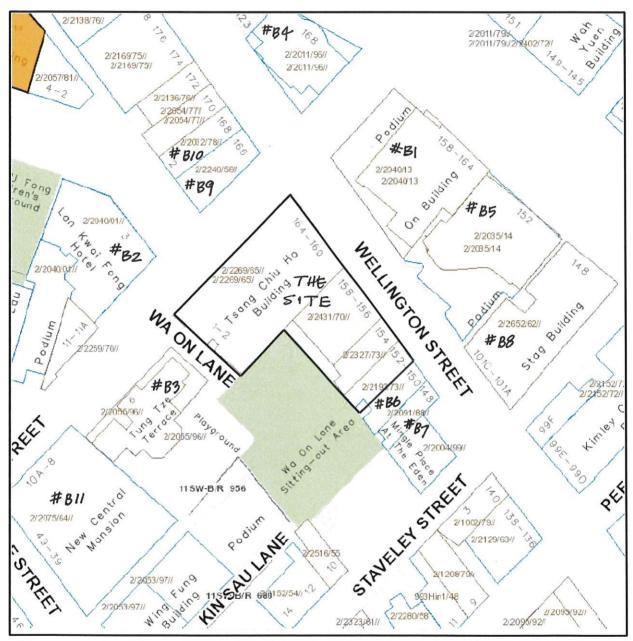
Layout of Adjacent Buildings with BD reference nos.
